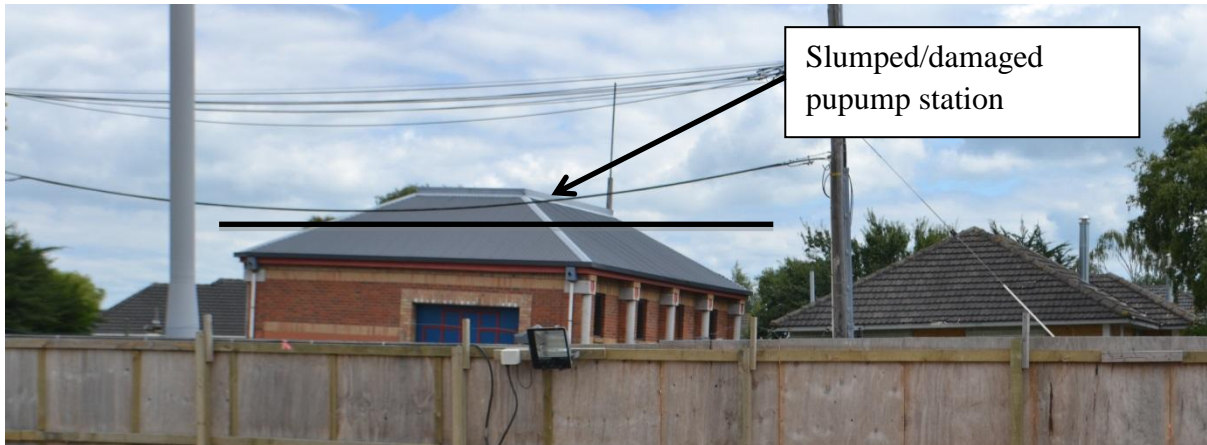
Currently damaged Pages Road gravity pump station (-43.513658°, 172.709793°). View from new gravity pump station construction site opposite. Photo courtesy of Dave Holland.
